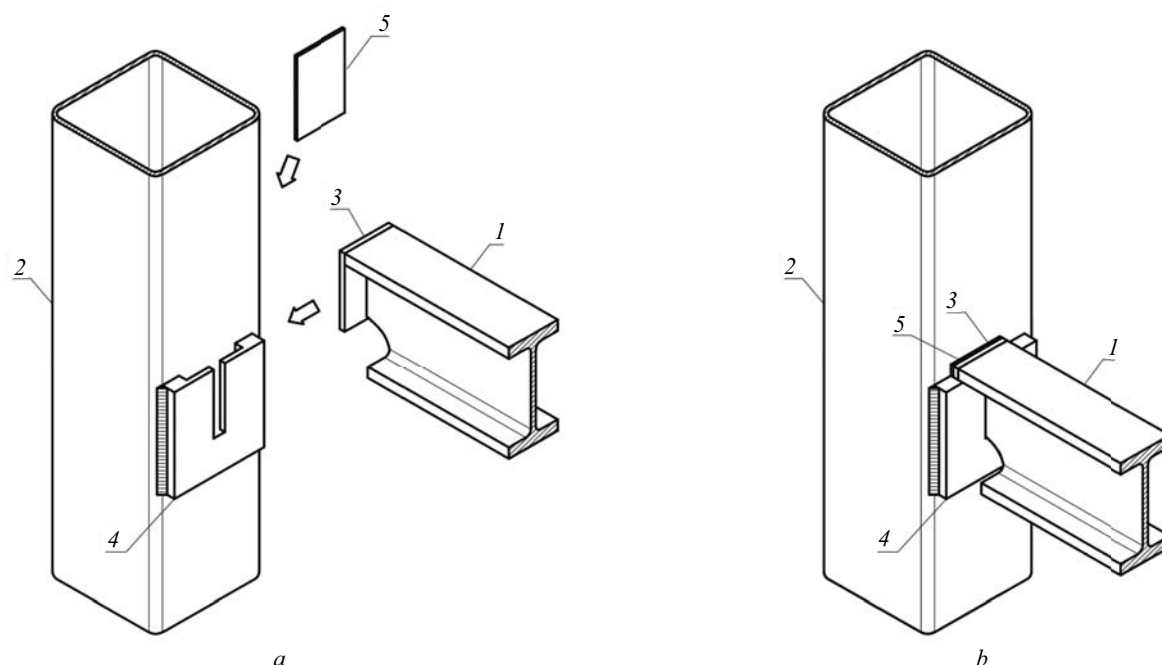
Assembly diagram of the beam-to-column joint based on the dovetail system: *a* — disassembled joint; *b* — assembled joint; 1 — beam; 2 — column; 3 — support rib; 4 — support socket; 5 — shim plate
